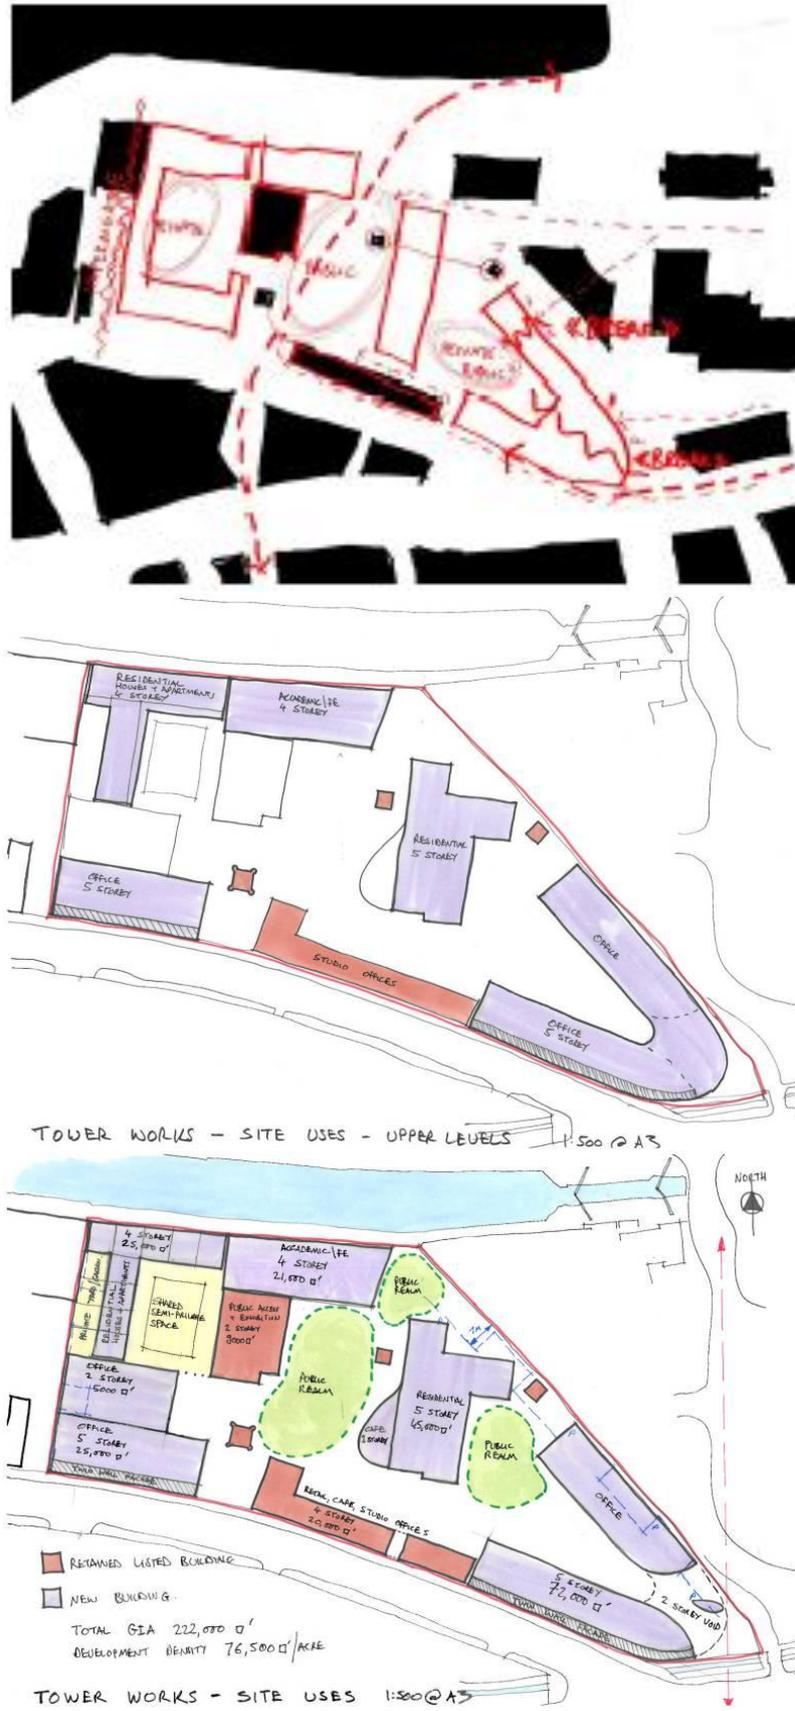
Schemes of Tower Works project © Carey Jones Architects.
